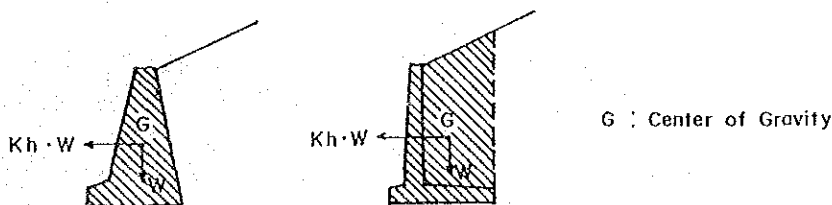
INERTIAL FORCE OF RETAINING WALL DUE TO EARTHQUAKE
